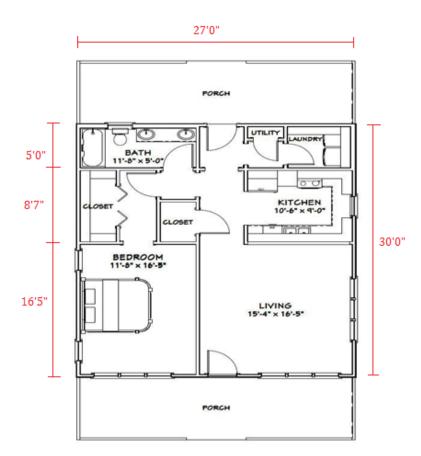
Plan of the example house (Source: https://www.pinterest.com/explore/shed-floor-plans/)
